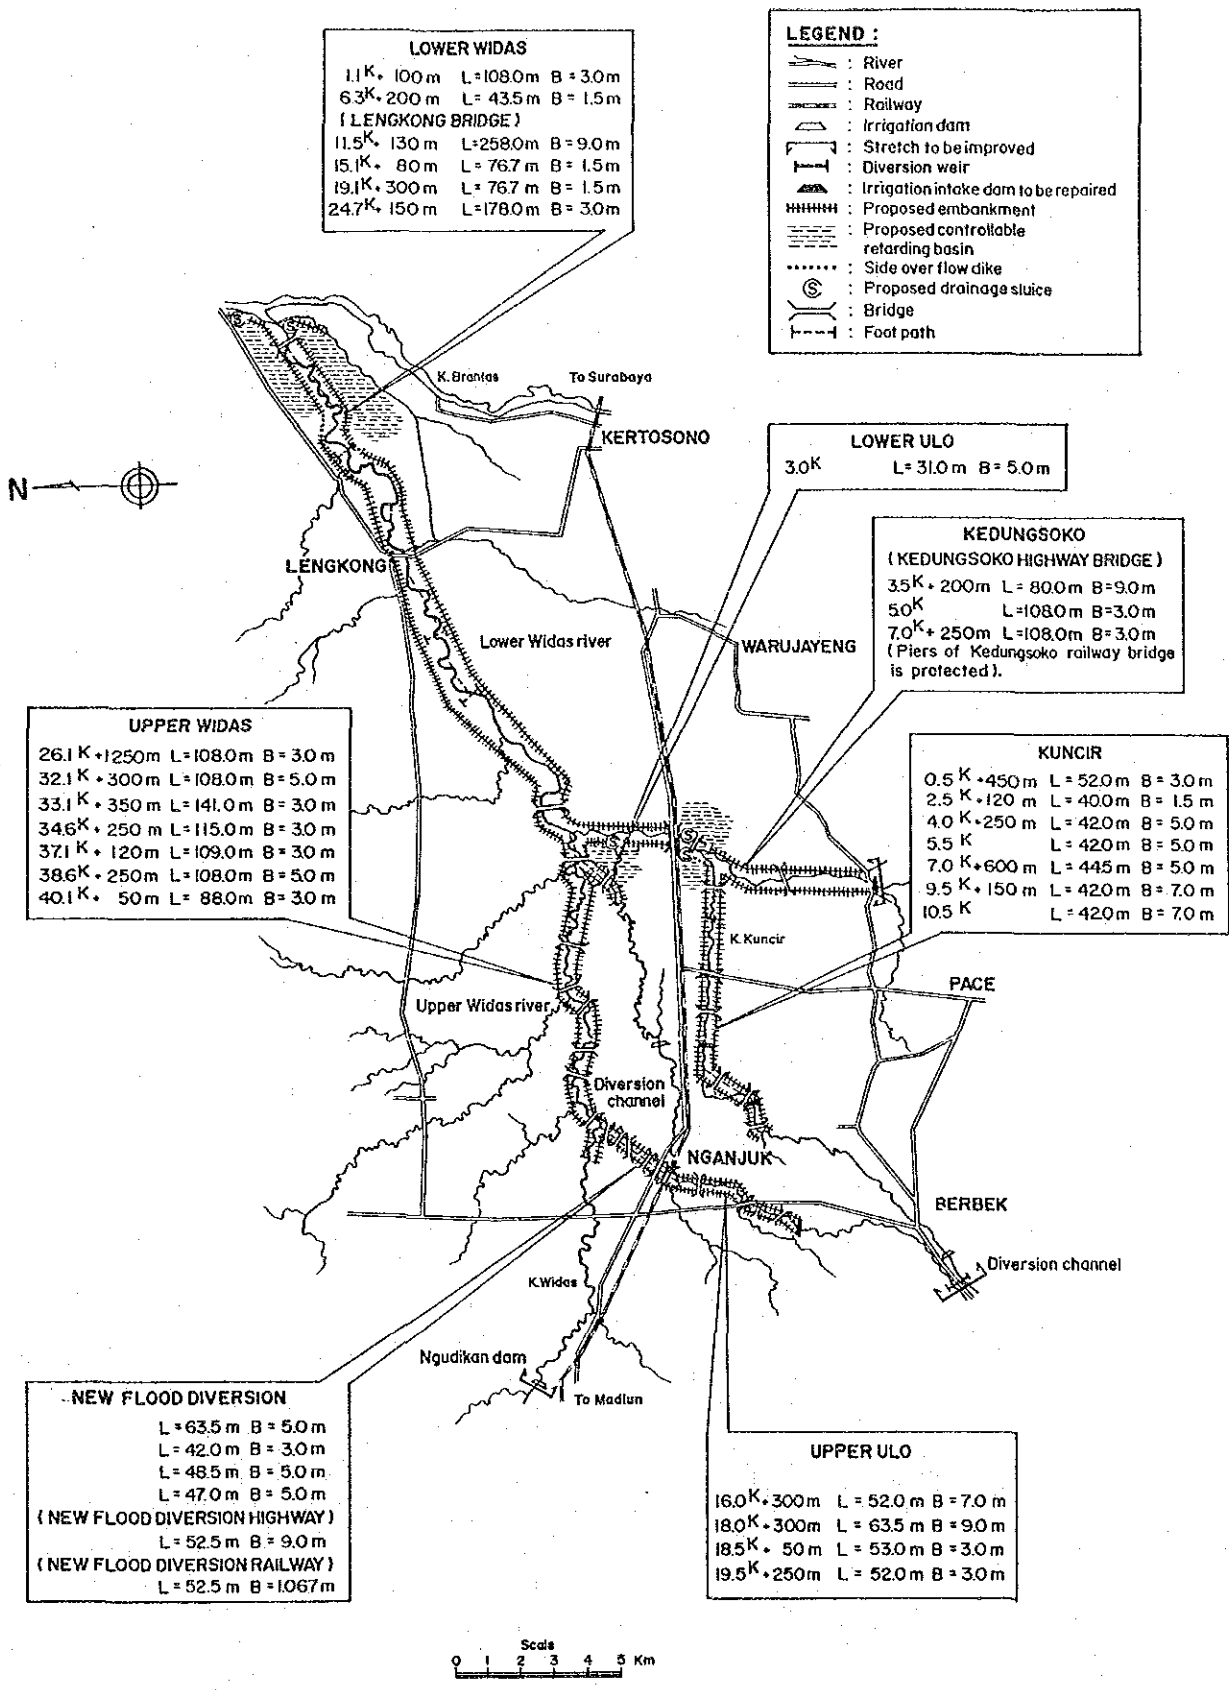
ii OUTLINE OF PROPOSED BRIDGES OF COMPREHENSIVE PLAN
